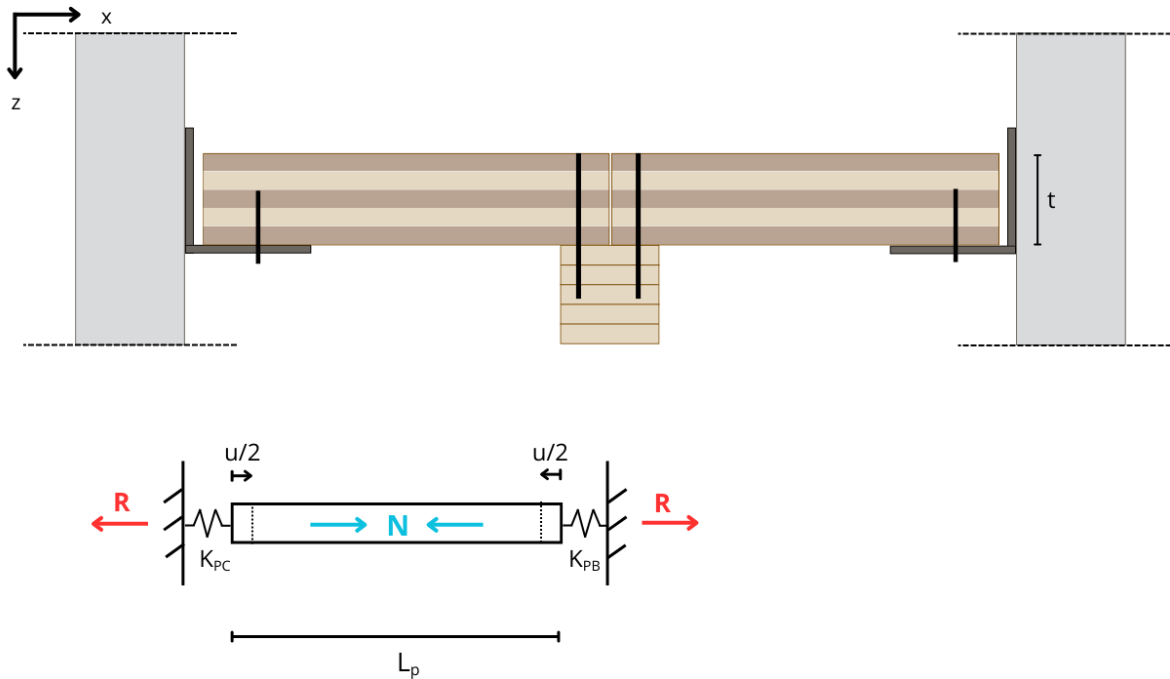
1D beam-spring model of two interacting CLT floor panels between two cores.
